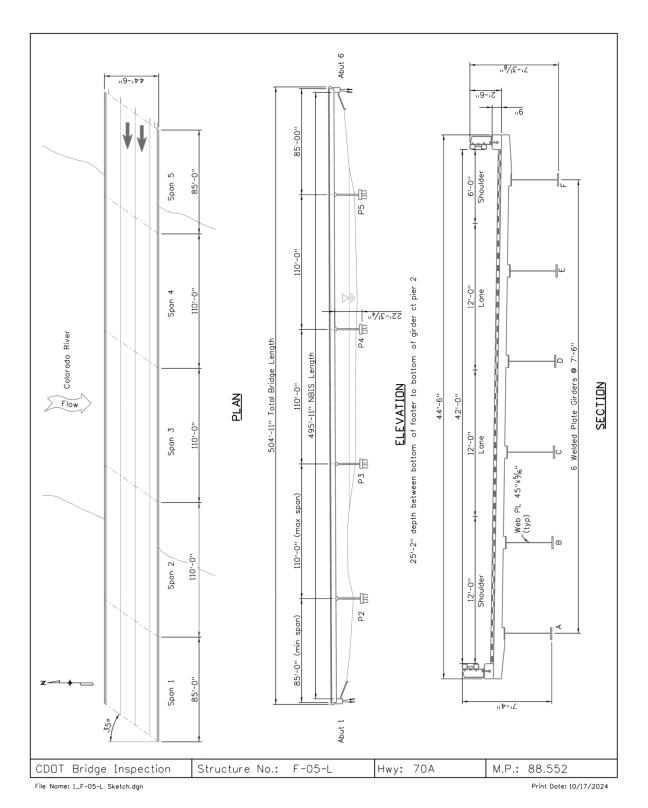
Bridge Inspection Sketch – Example 1
